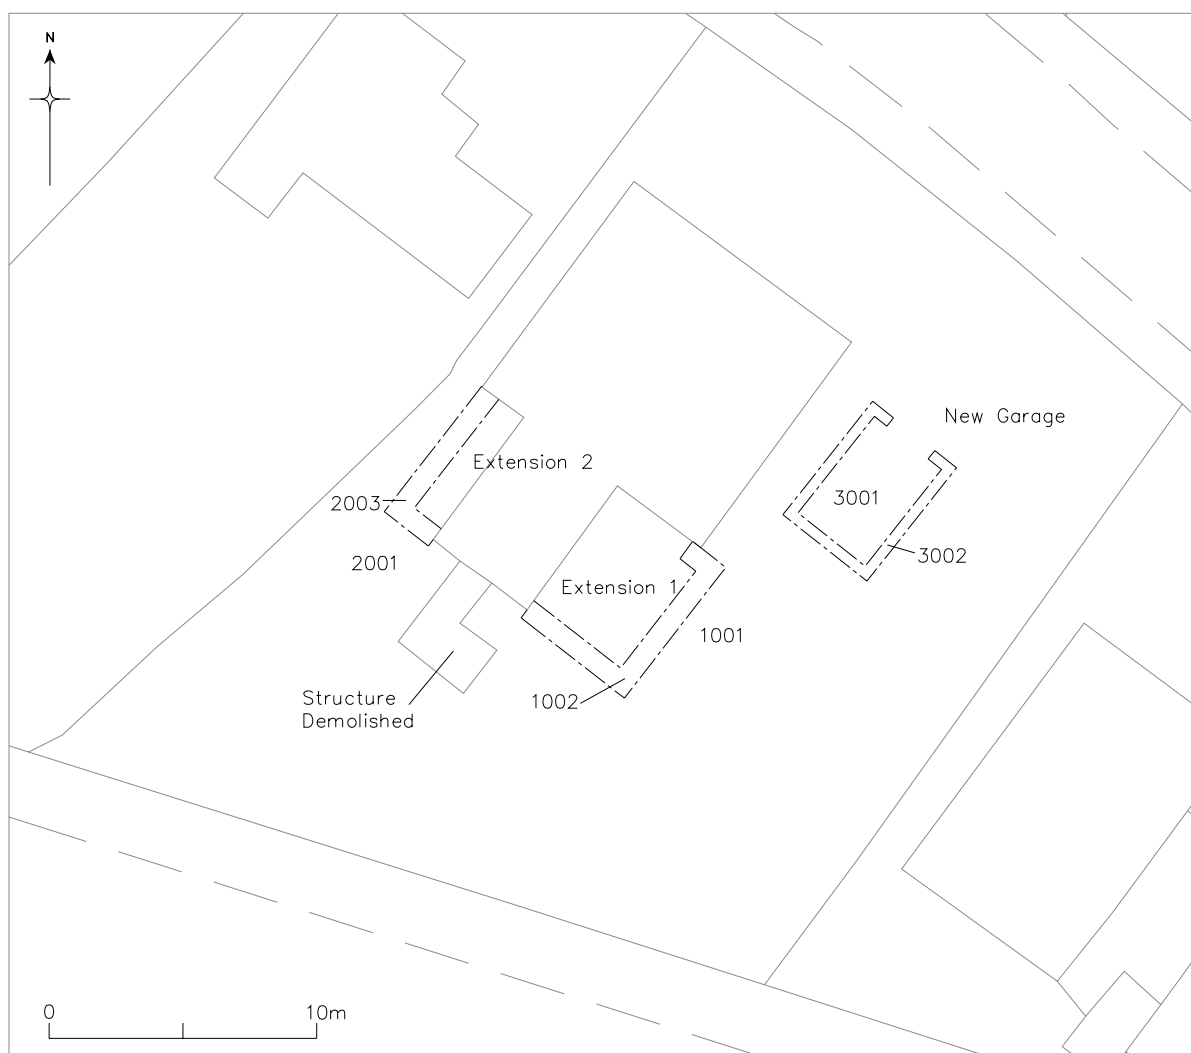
Plan showing the location of the foundation trenches and deposits recorded.
